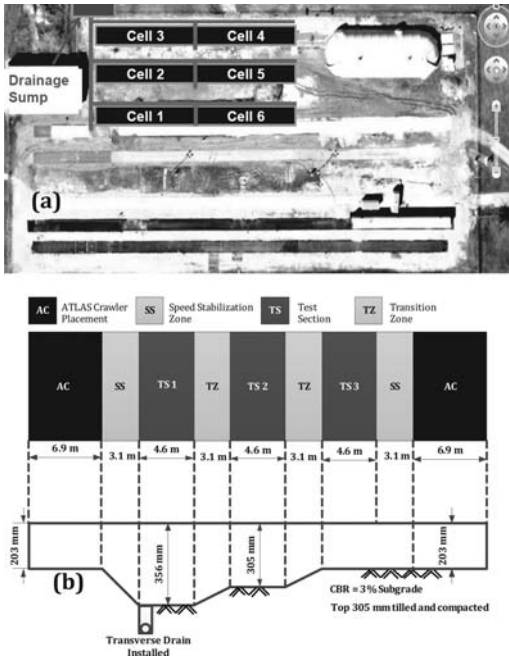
(a) Aerial map of test section layout, and (b) plan view (on top) and cross sectional details of the full-scale pavement test sections.
